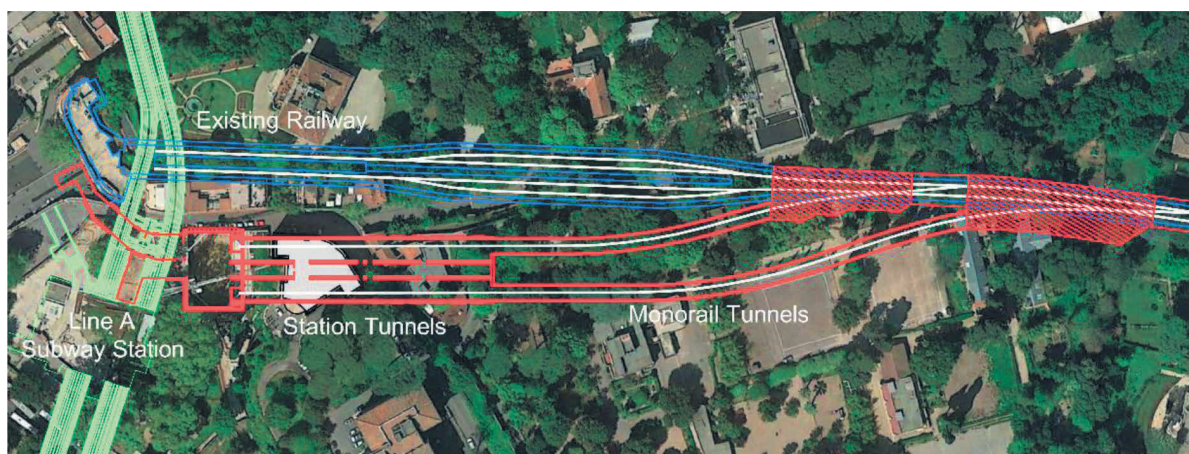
Plan view of the new works and the existing network of connections in Piazzale Flaminio.
